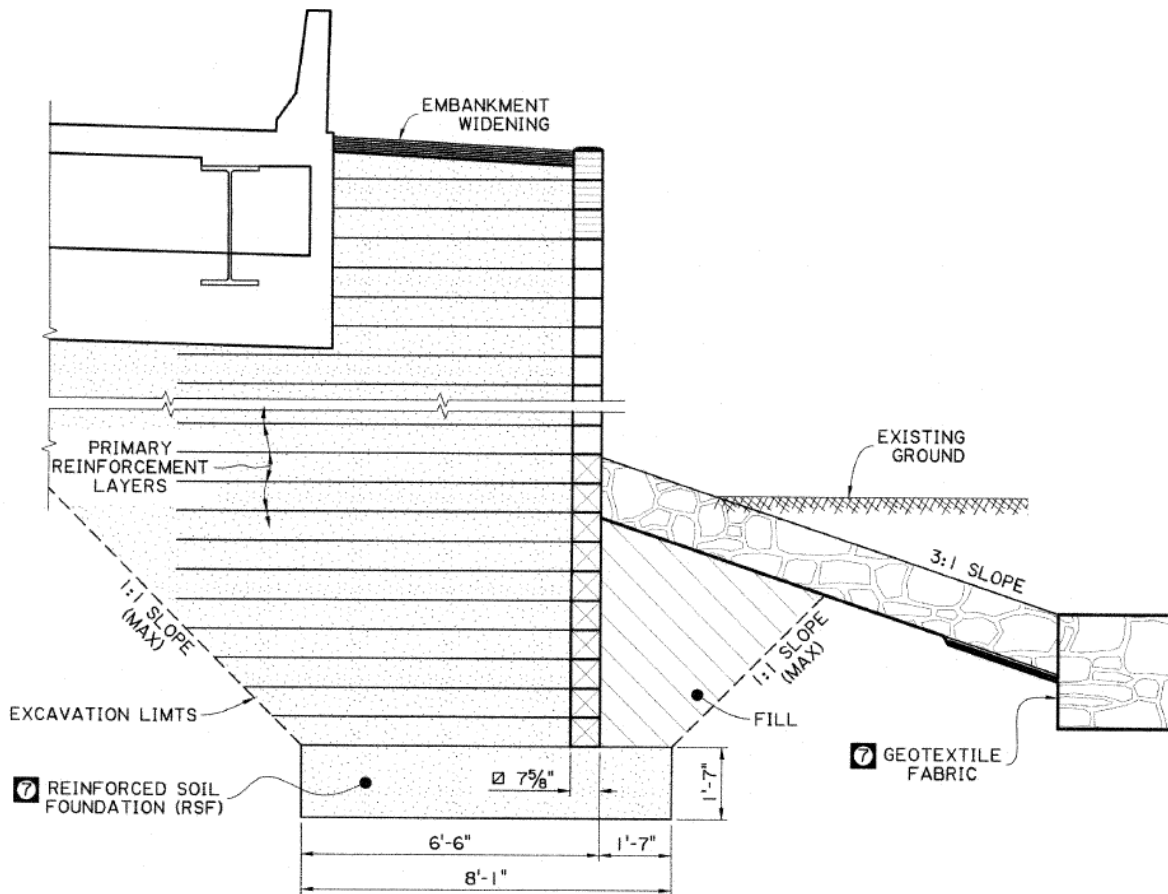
Diagram. GRS abutment wingwall section view of Maree Michel Bridge.
